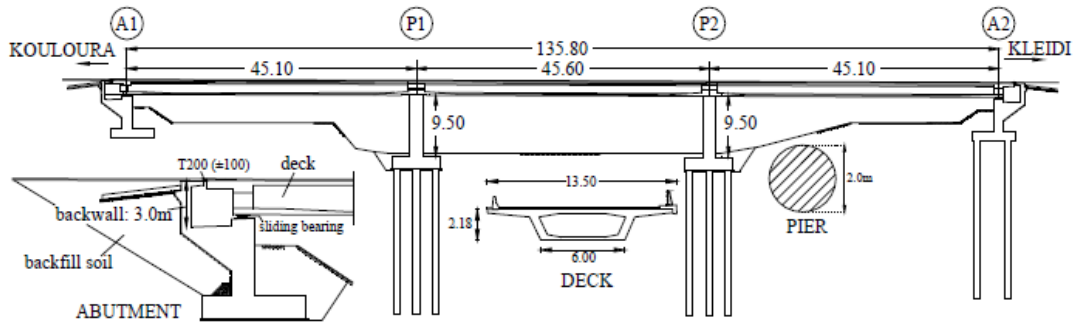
Longitudinal section of Kleidi-Kouloura bridge and the cross sections of the abutment, the deck at the mid-span and the pier.
